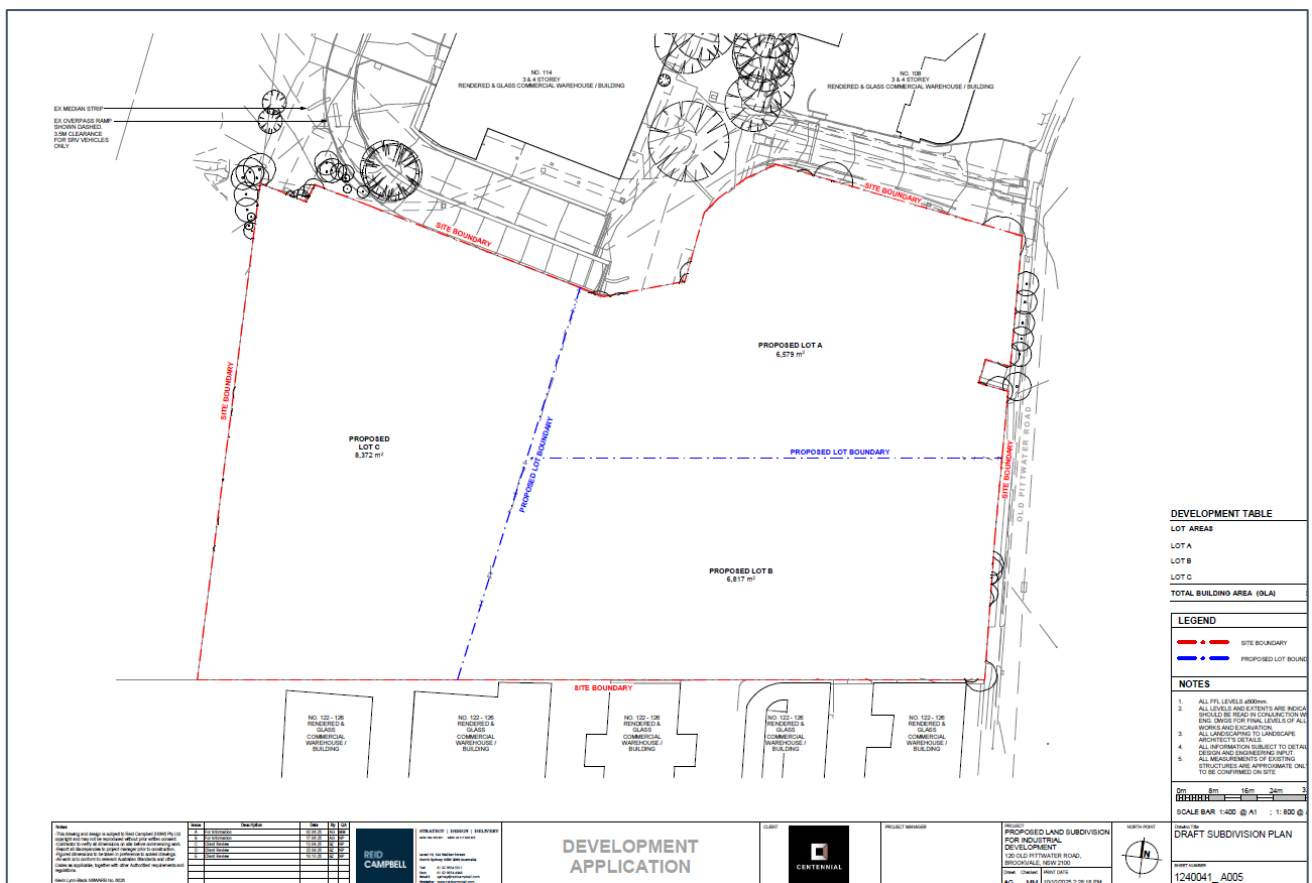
Subdivision plan indicating Lot A, Lot B, and Lot C (Source: Reid Campbell)
